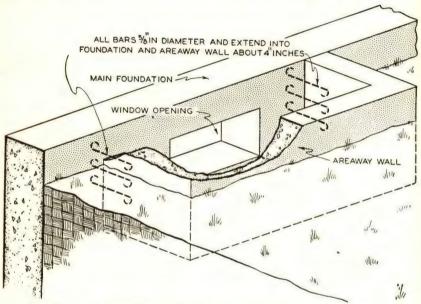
Use of Reinforcing Rods to Tie Areaway Wall to Main Foundation
